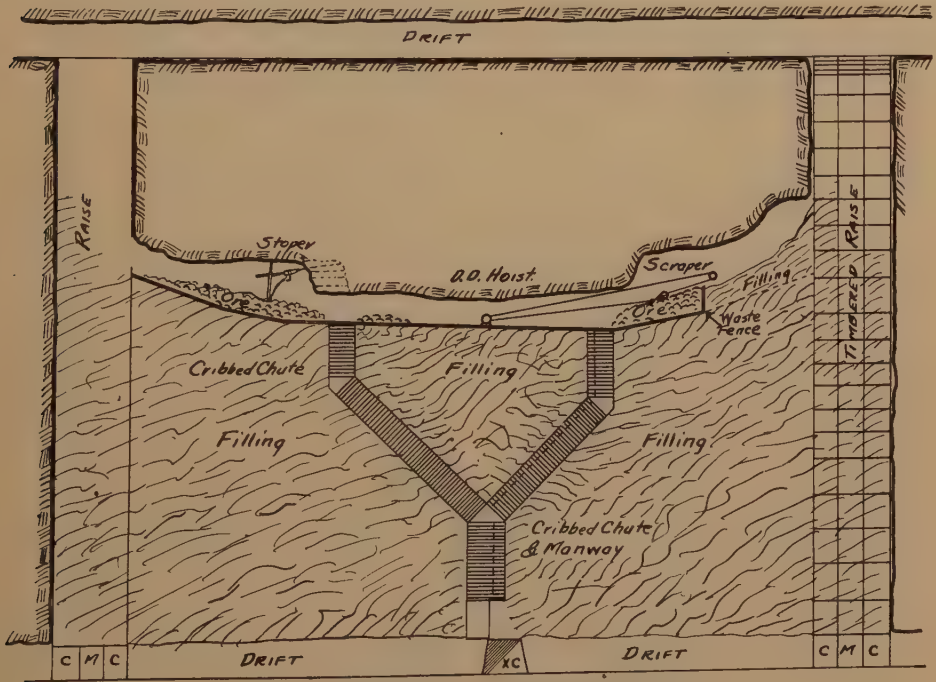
HORIZONTAL CUT-AND-FILL STOPE.
